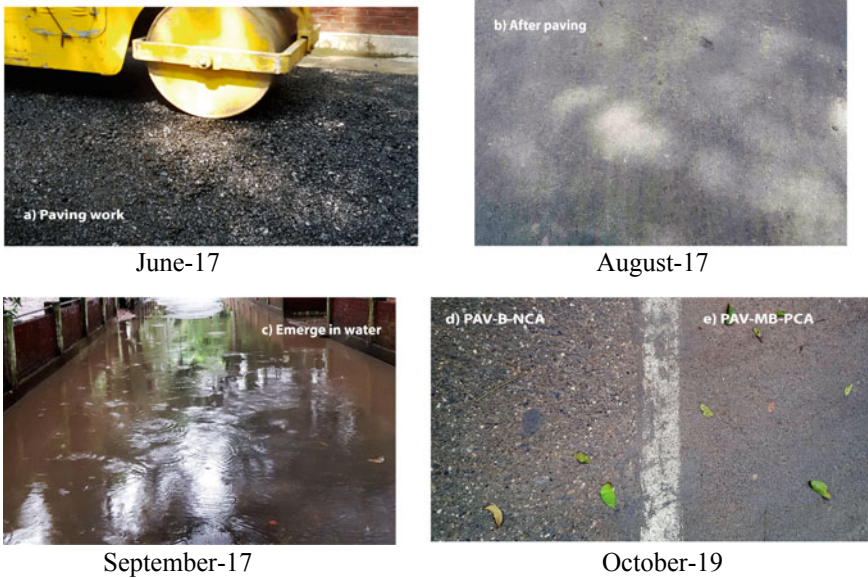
Pavement construction and surface of the pavements (June-2017 to October-2019)
